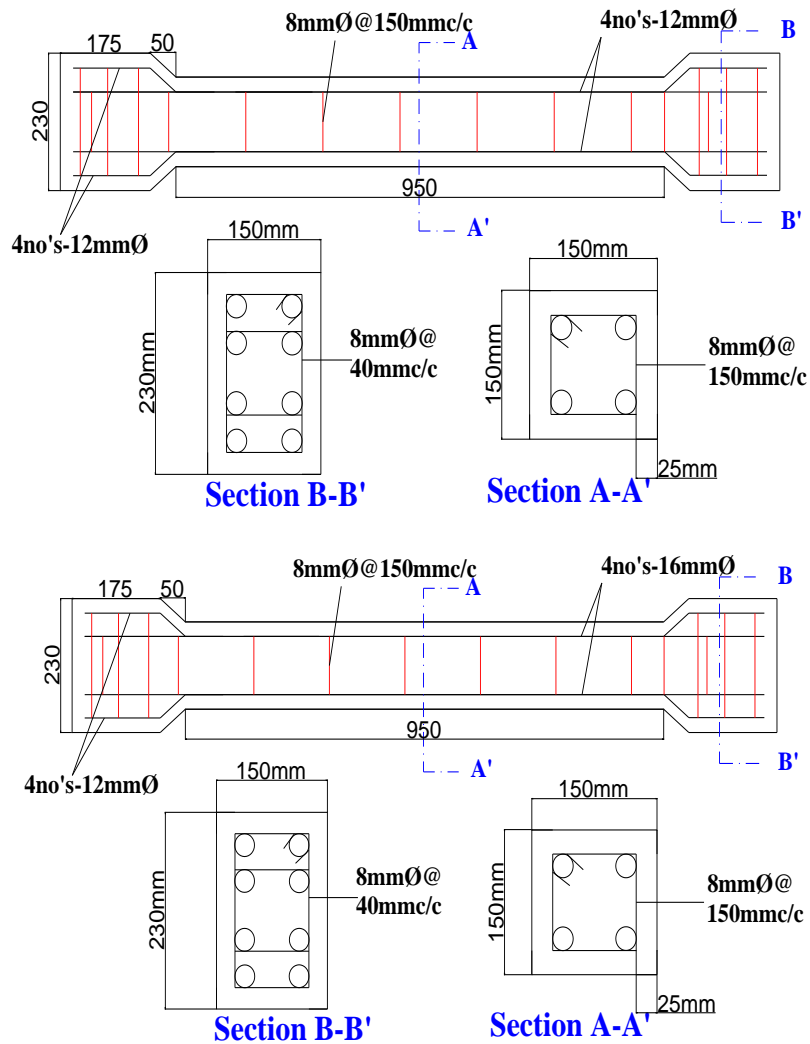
Reinforcement detailing of 12# and 16# bar columns
